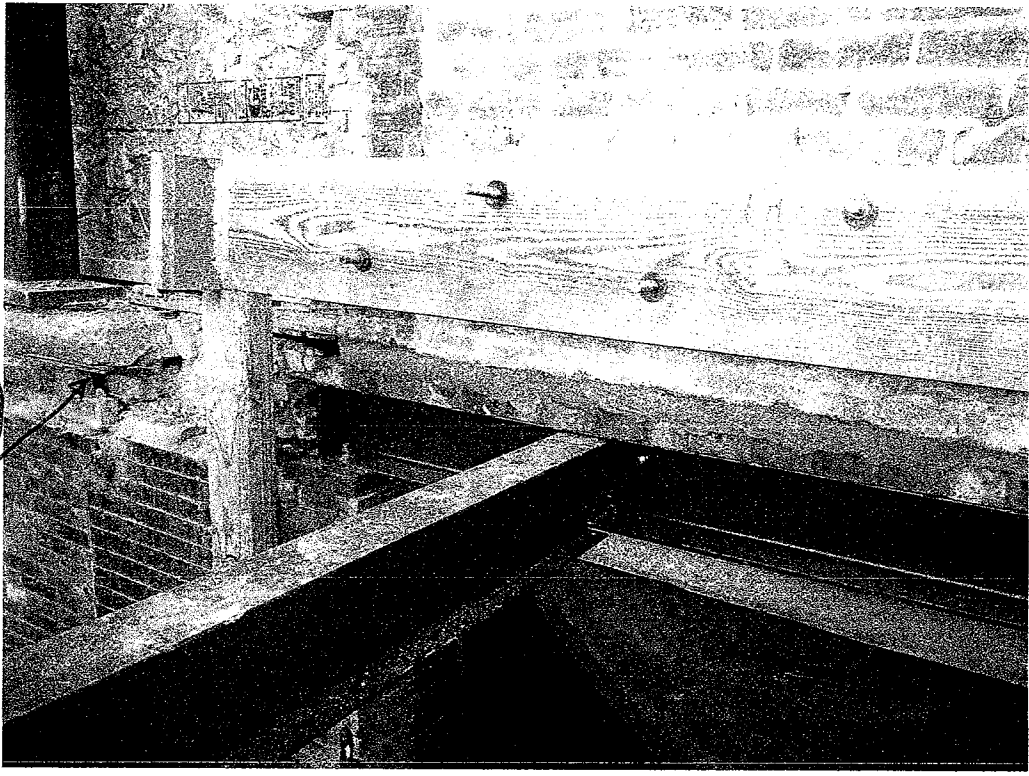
Structural steel lintel above door at basement grid F/5.4. Note plywood below existing F/5.8 column at upper left corner of photo.
